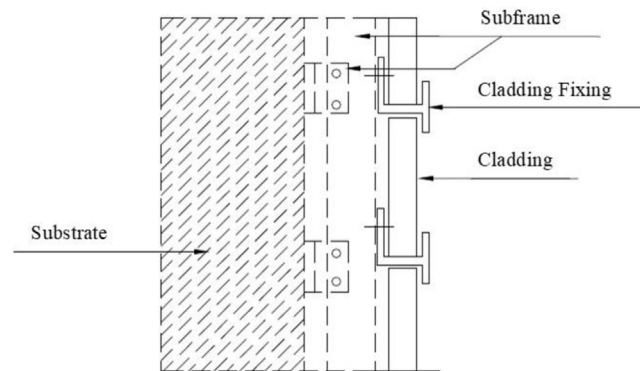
Cladding kit with cladding elements mechanically fixed to the substructure by 4 clips (minimum) or metal rails.
